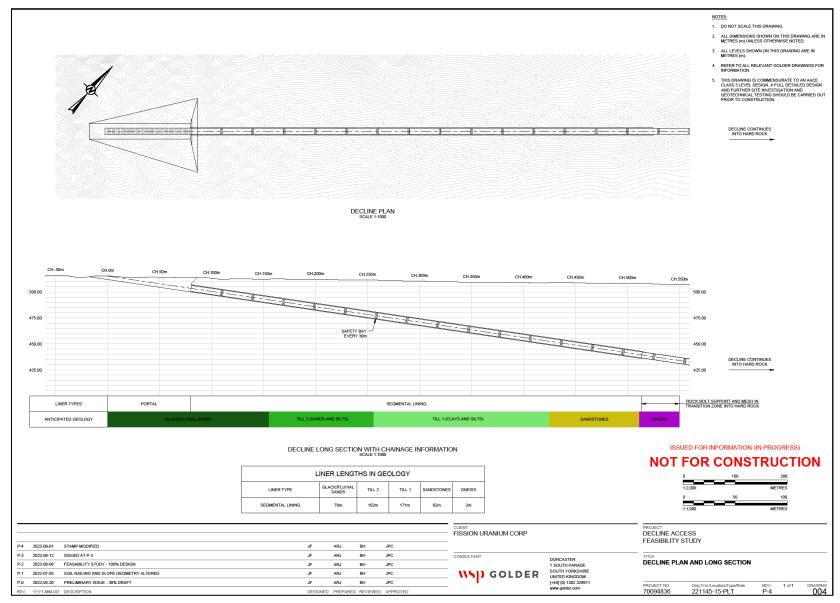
Decline and Box Cut Excavation Plan and Long Section.
